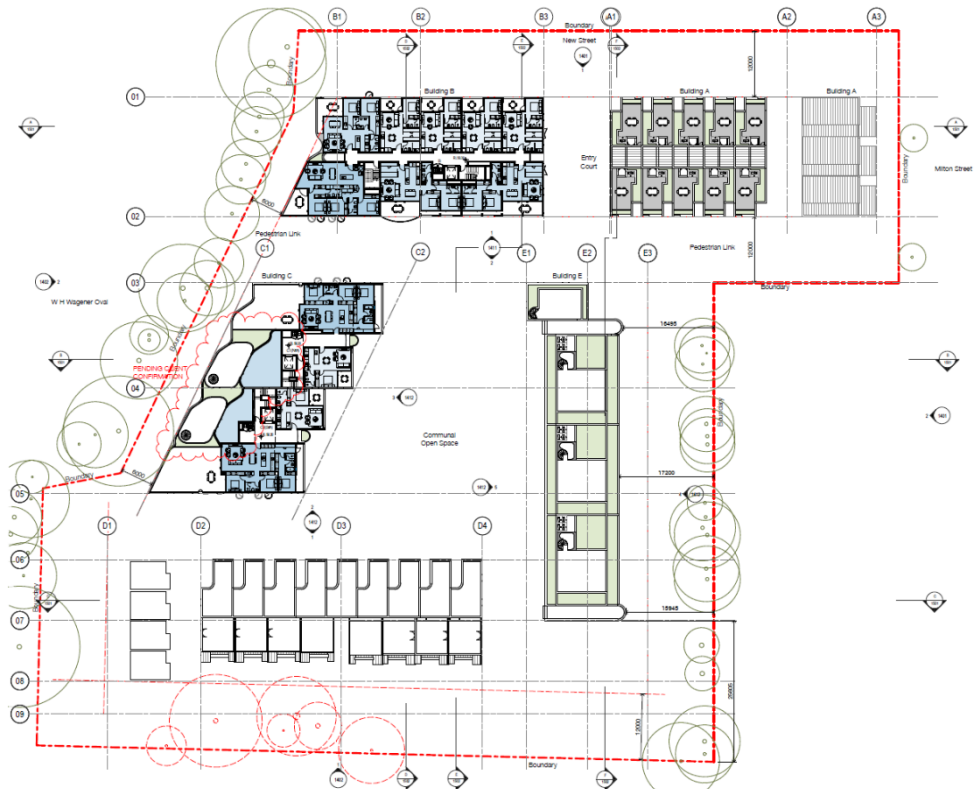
Proposed Overall Level 4 Plan. (Source: SJB Architects)
